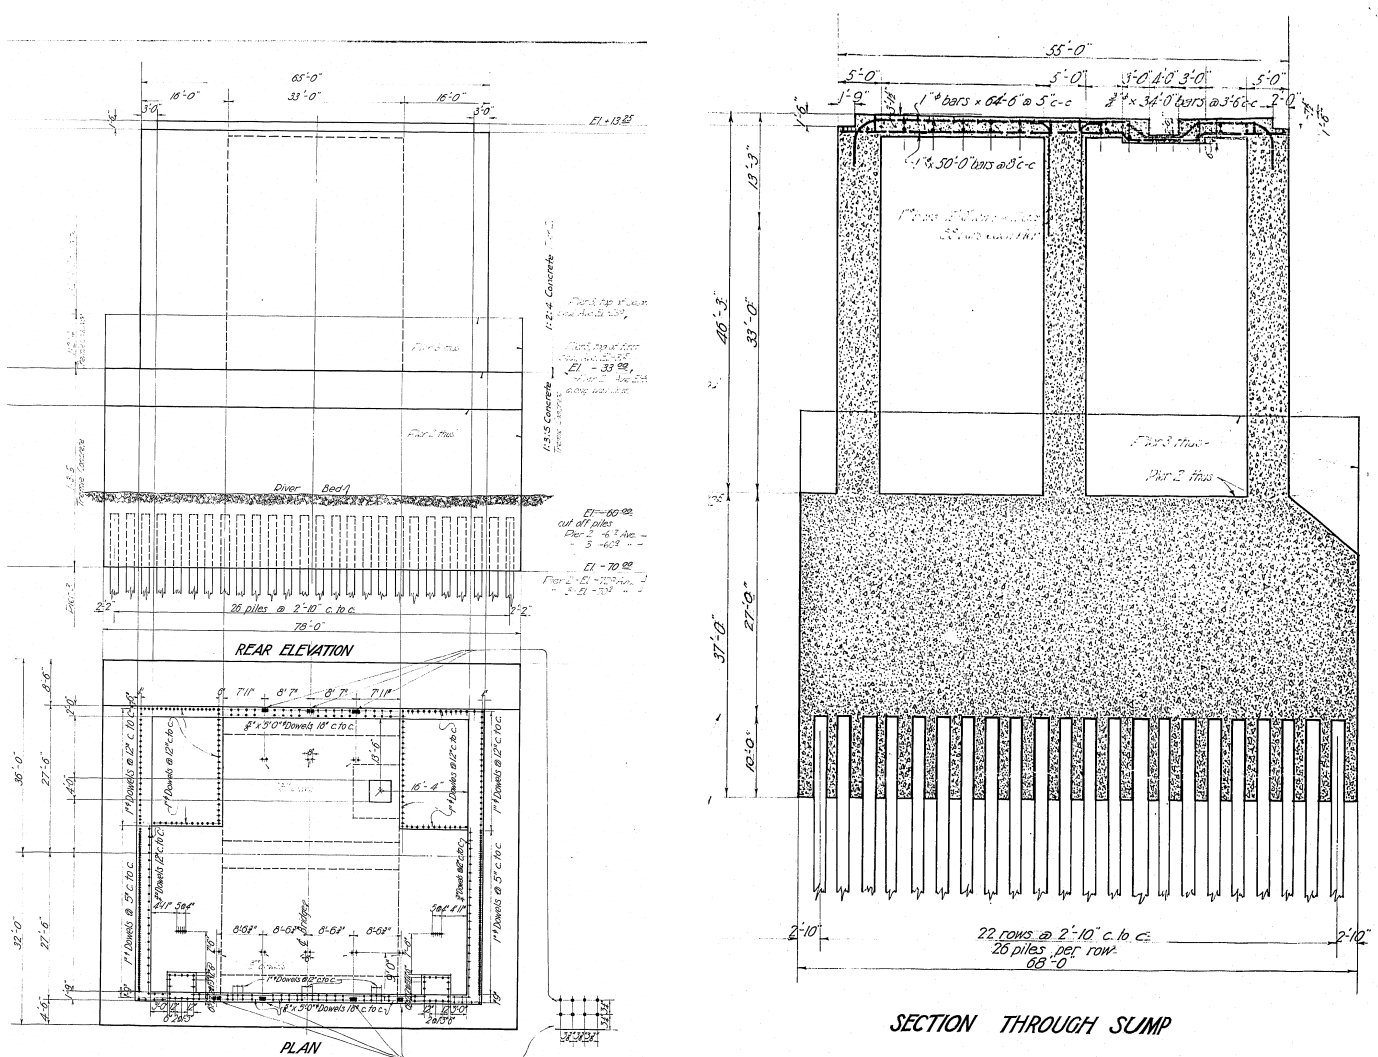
Burnside Bridge Movable Spans Piers 2 & 3, foundation piles (outer piles) in both compression and uplift
